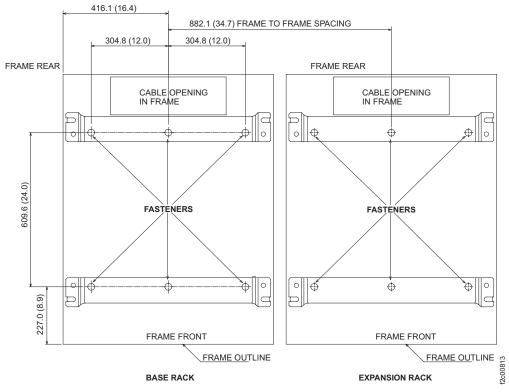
Locations for fastener installation (non-raised floor). Dimensions in millimeters (inches)
